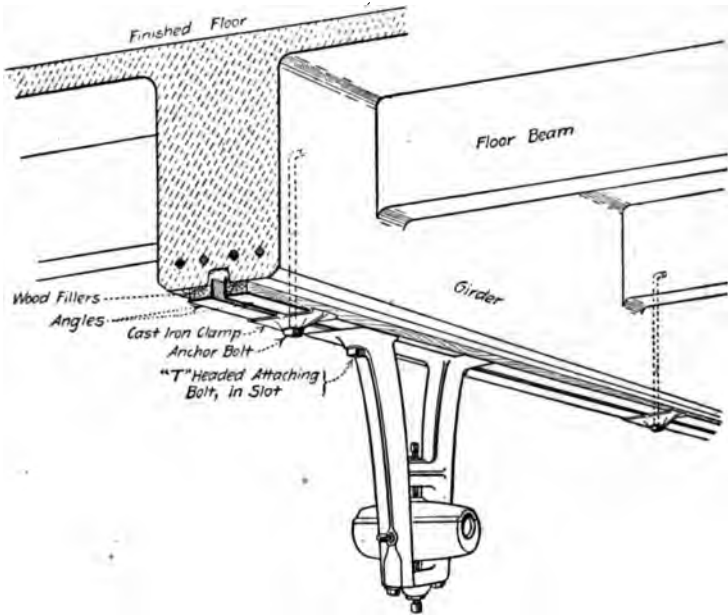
View of Angle Slot Hanger Construction for Shafting.
